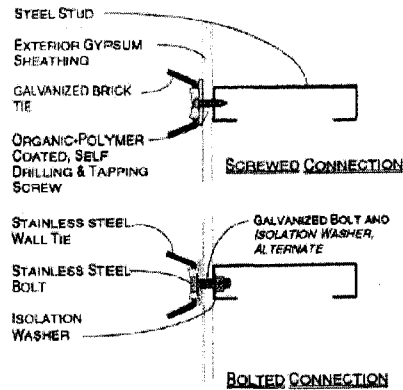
Connection detail for structural stud to exterior wall requires a screw or bolt hole placed in the stud flange (Western States Clay Products Association 2004)
